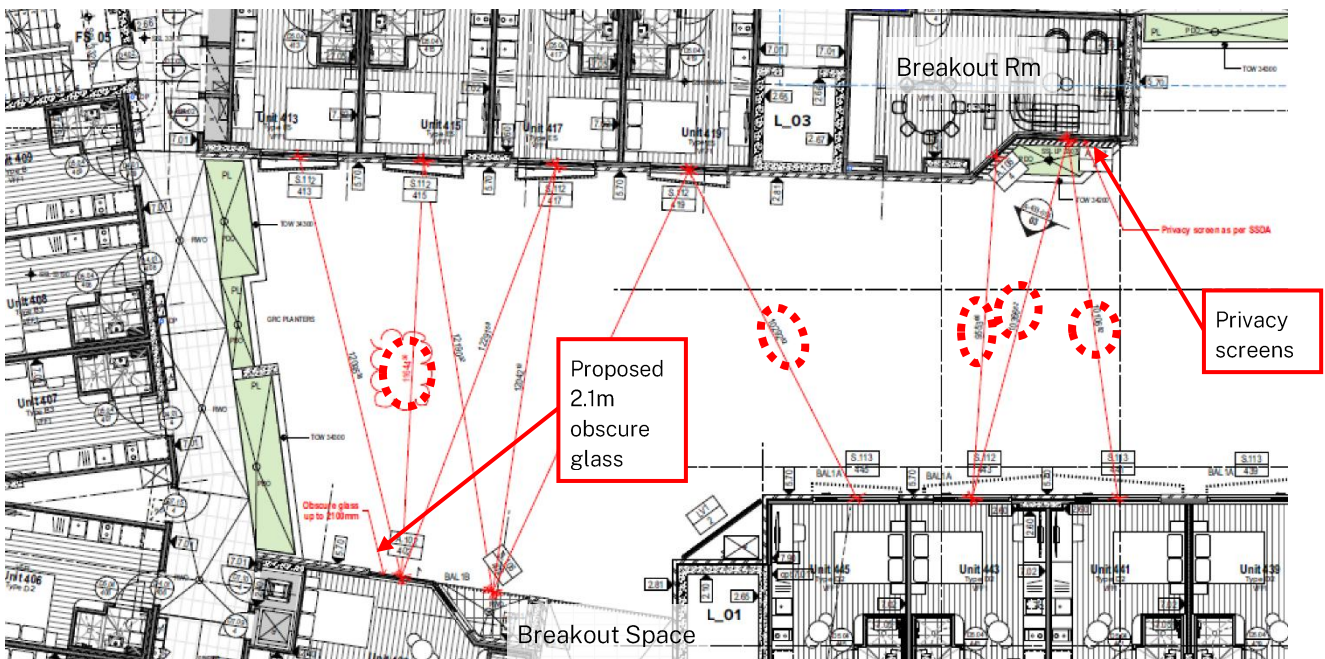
| Typical Level 1 to 4 internal building separation (Source: Applicant's RtS, 2026)
